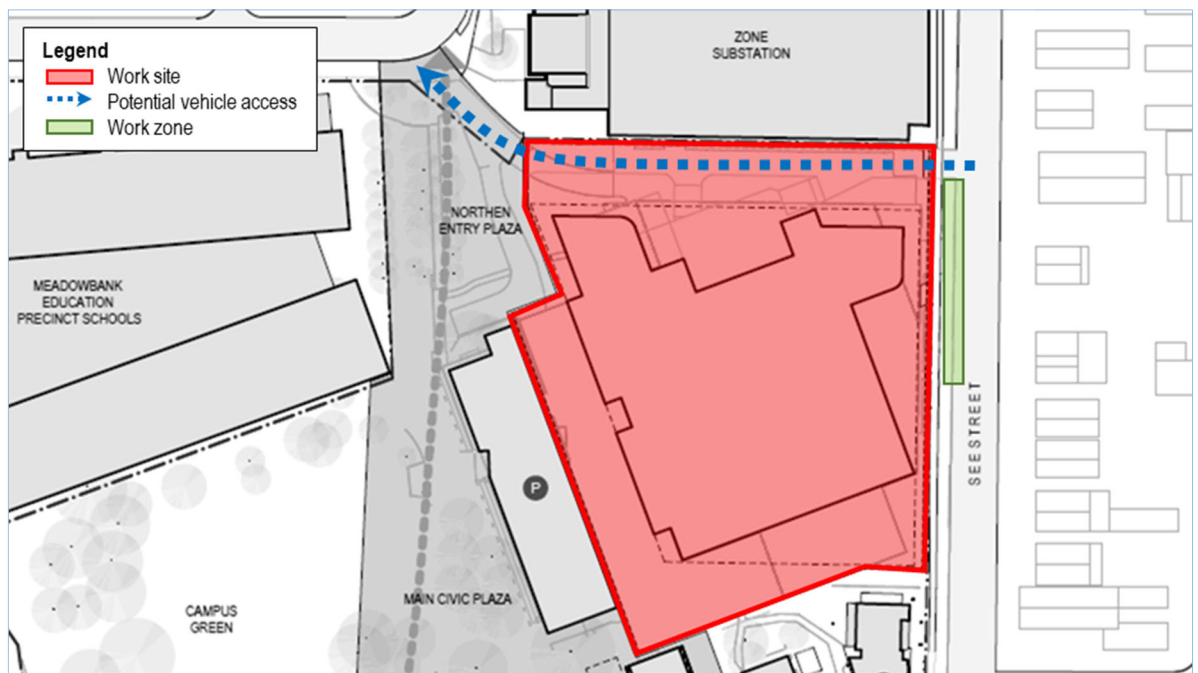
Proposed Construction Work Site Access (Source: GTA Traffic and Accessibility Assessment Report- September 2019)
